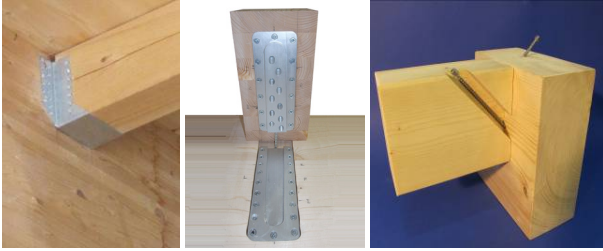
typical joist connections for timber structures (from left: joist hanger, dovetail connector, full thread screws)
